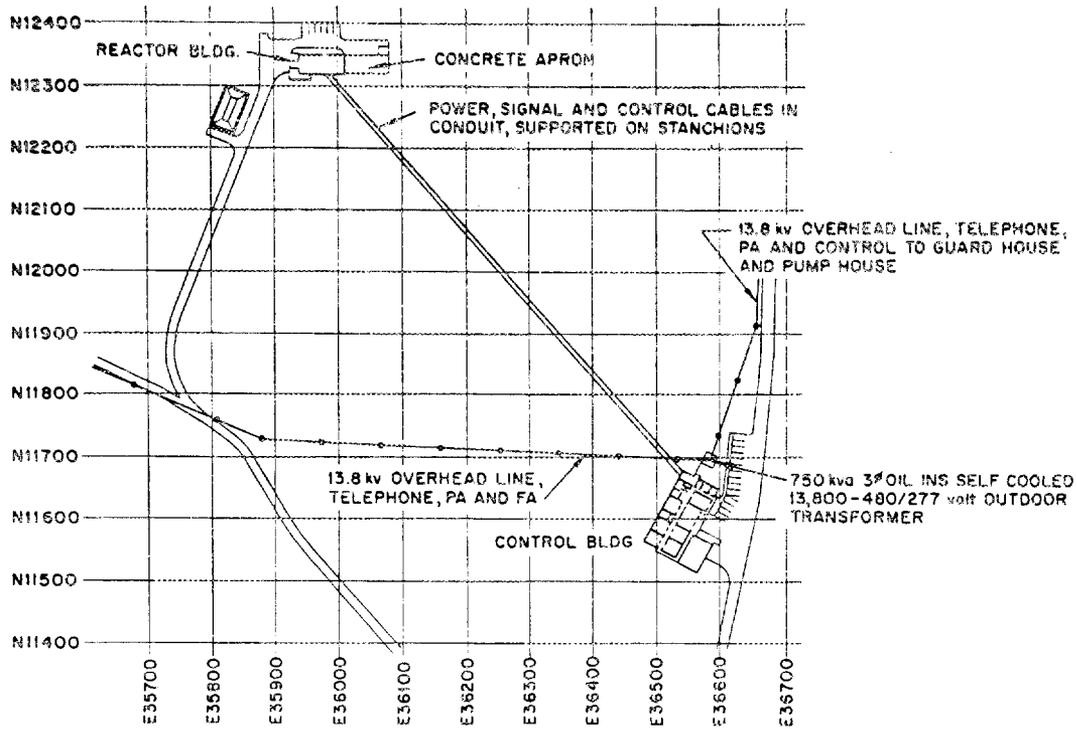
Plot plan of DOSAR Facility, showing locations of reactor and control buildings.
